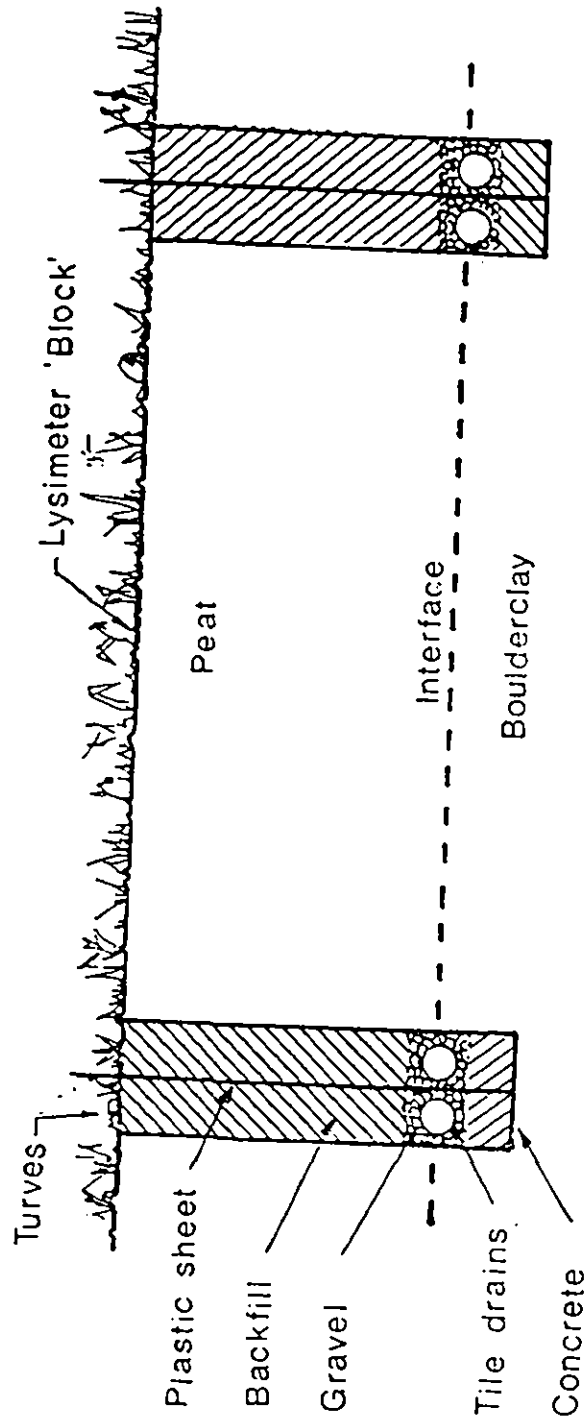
CROSS-SECTION OF LYSIMETER SHOWING DETAILS OF CONSTRUCTION
